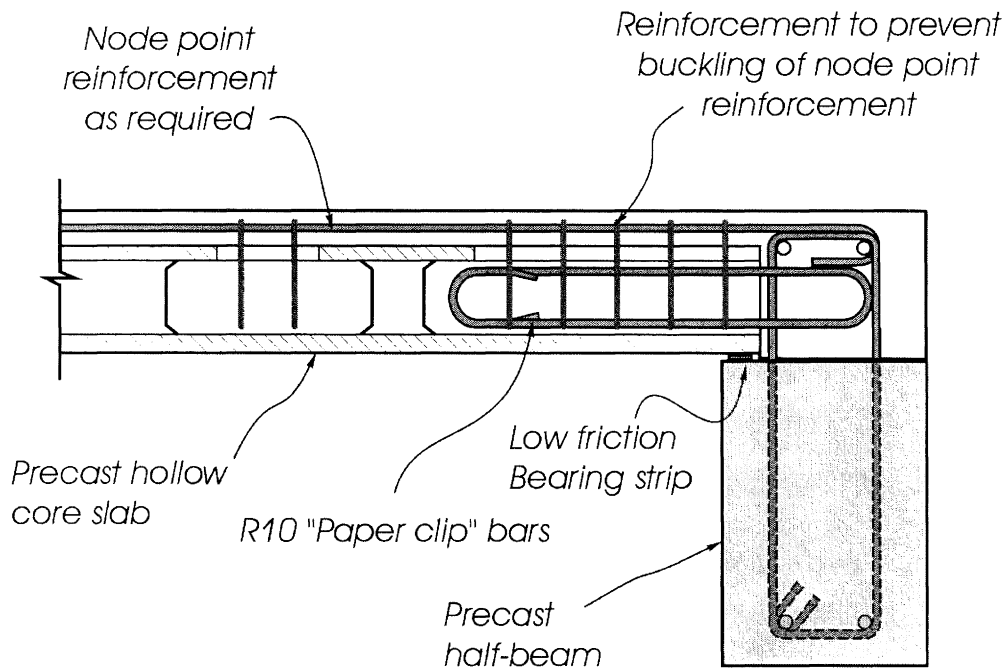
Strut and Tie Node Point for Hollow Core Precast Units, with Topping (after McSaveney, 1997).
